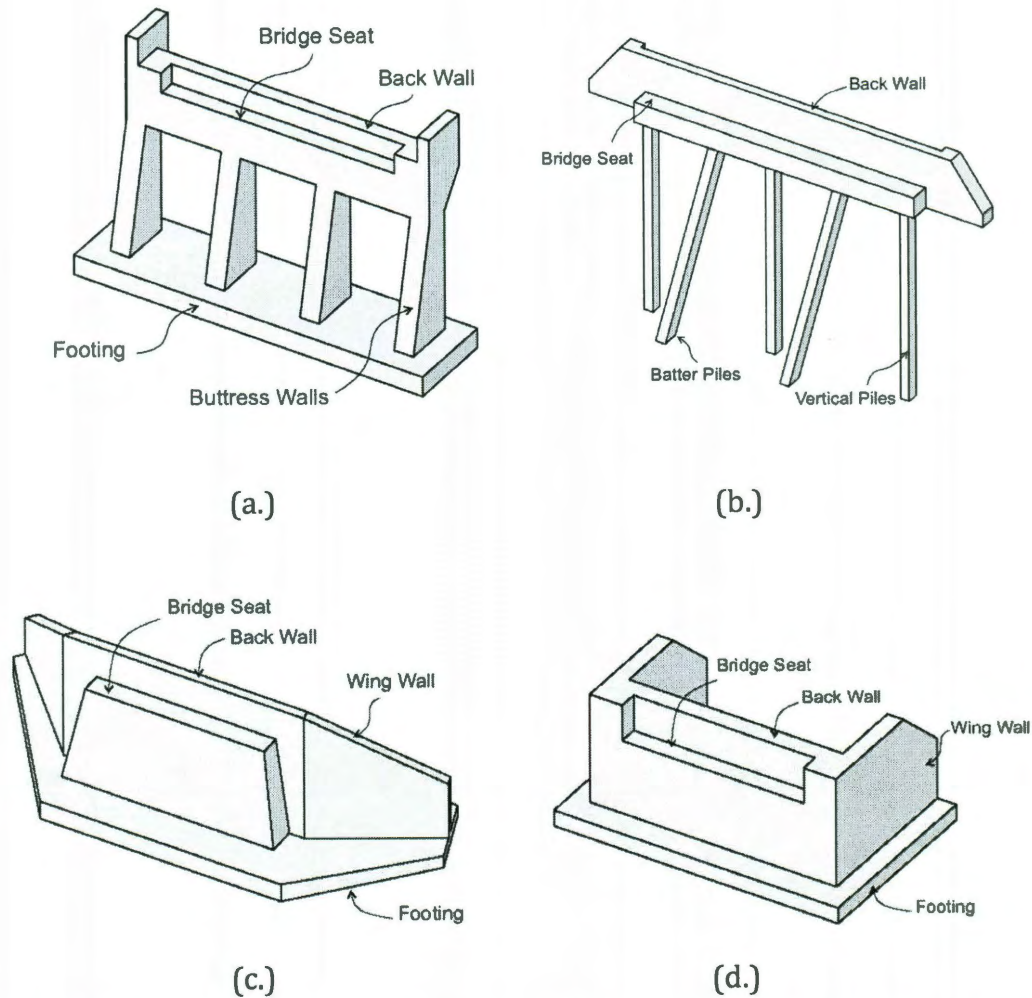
Examples of Abutment Types (a.) Sloping Spill Through; (b.) Vertical Wall; (c.) Wing Wall with Angled Wings; and (d.) Wing Wall with Perpendicular Wings (Nielson, 2005).
